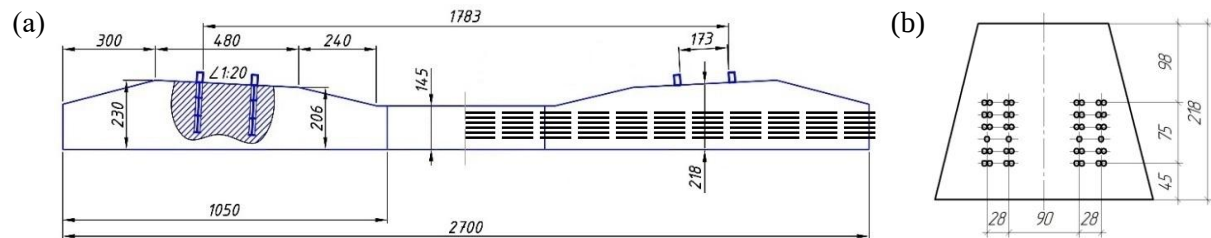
The reinforcement in serial reinforced concrete sleepers: a – in the longitudinal direction; b – in the rail seat cross-section
